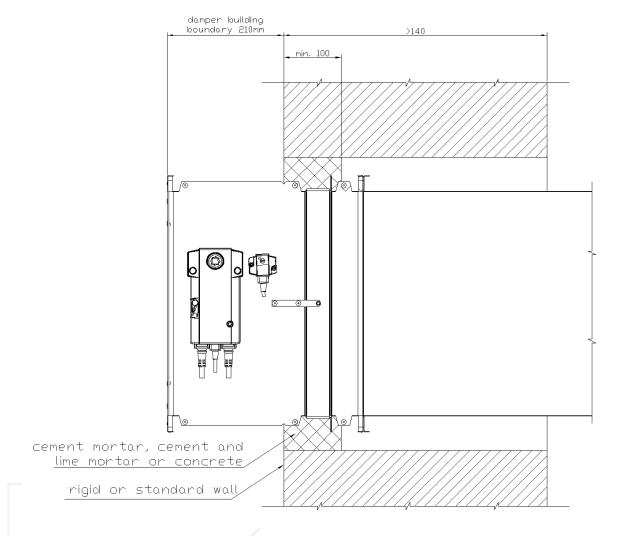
Installation method of fire dampers KWP-L in constructions of great thickness
